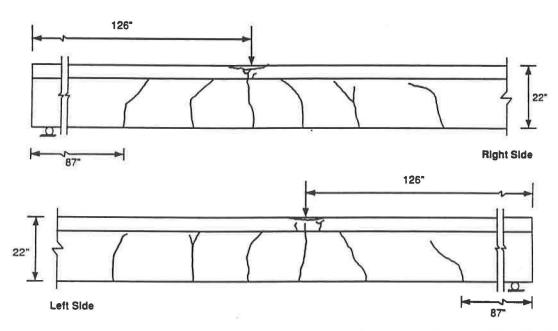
Crack Diagrams for Test 18. (Beam 10, End B, 2.0 Inch Strand Spacing, Pour 3 - High Strength Mix, Unconfined, 126 Inch Embedment Length, Flexural Failure.)
